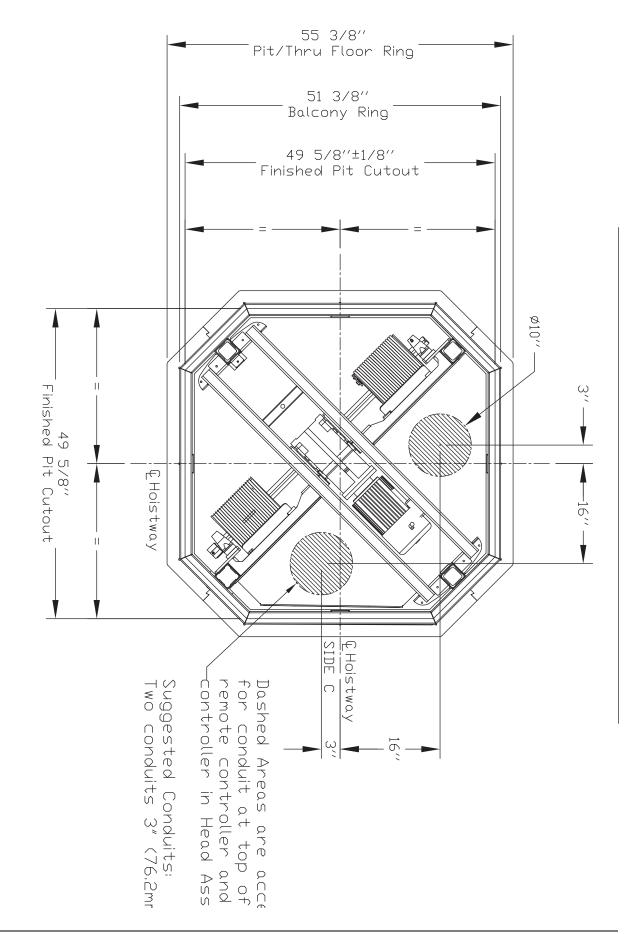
Pit cutout/thru-floor cutout - octagonal acrylic (OAM) type 1
